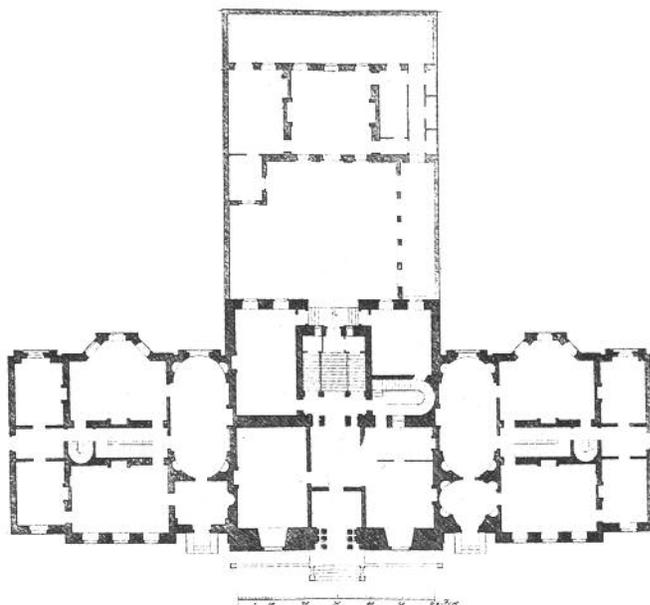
James Paine, ground-floor plan of the Mansion House, Doncaster, from his *Plans, Elevations, Sections... of the Mansion House... of Doncaster*, London, 1751.
